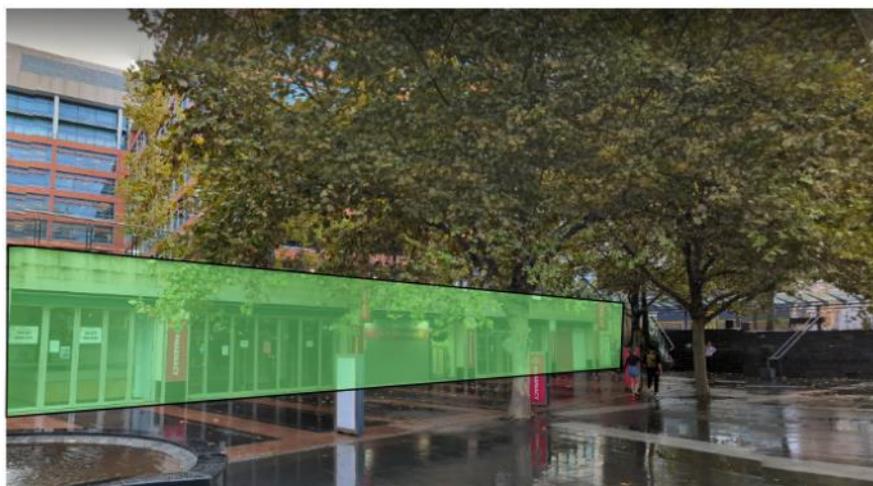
Site plan showing location of HDP retail demolition in Green.
